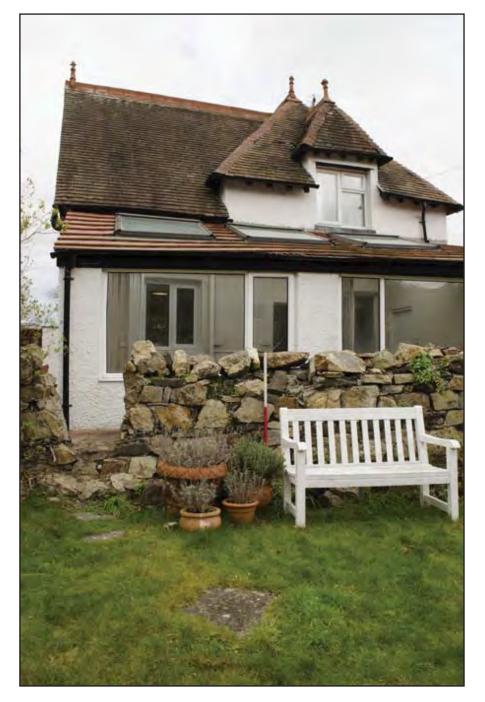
Southwest elevation of sunroom and rear of property from the garden; scale 1x1m; (archive reference: G2738\_007).
